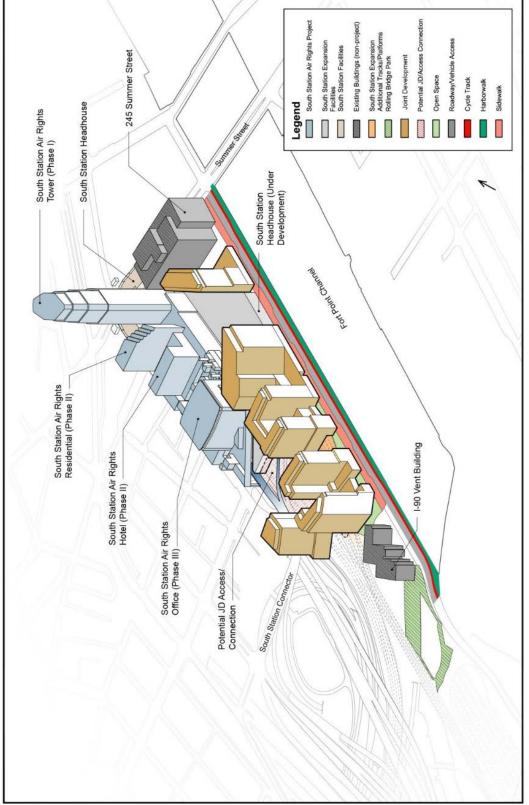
South Station Site Joint/Private Development Alternative 3, Massing Concept
